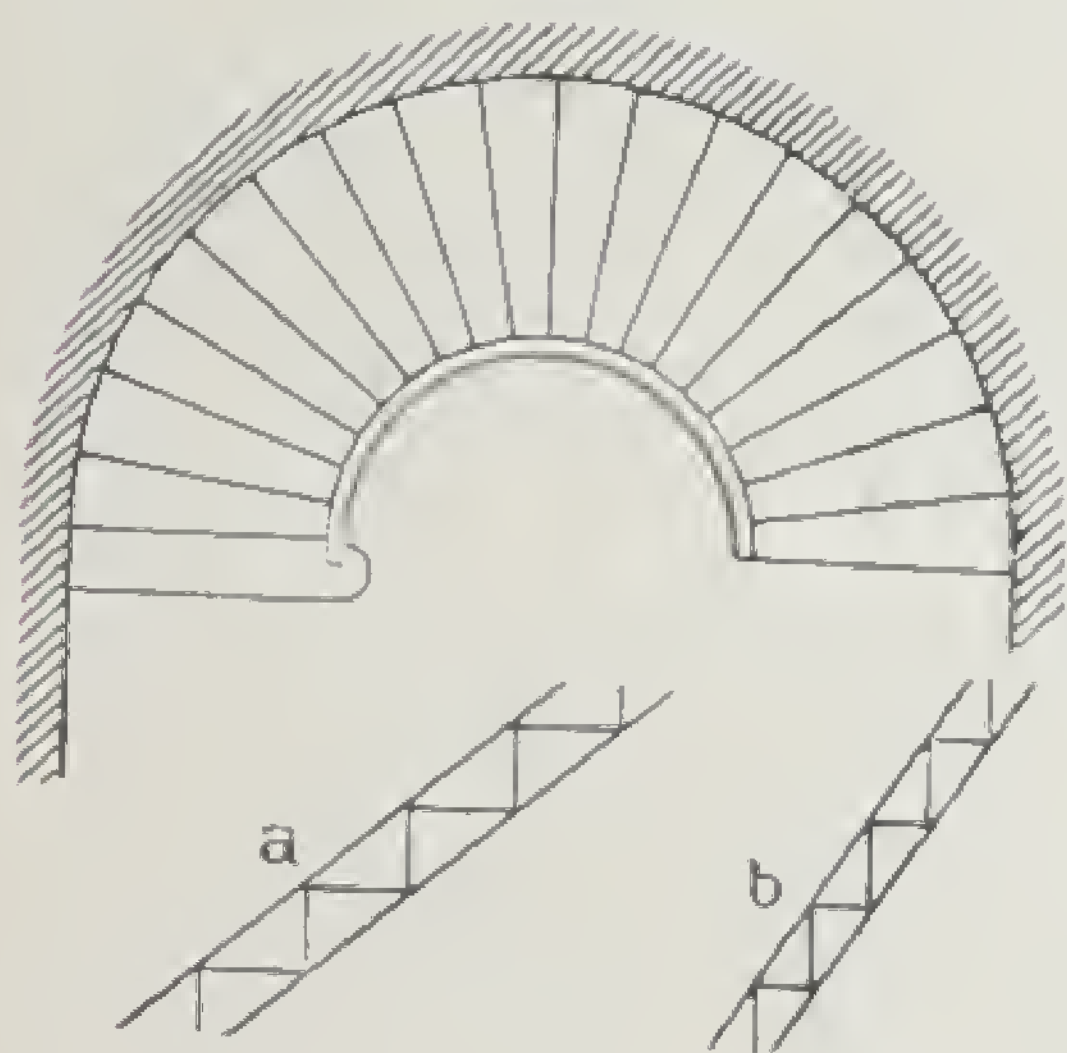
Ground plan of a winding staircase, *a* is the wall frame, *b* the inner frame or carriage.
